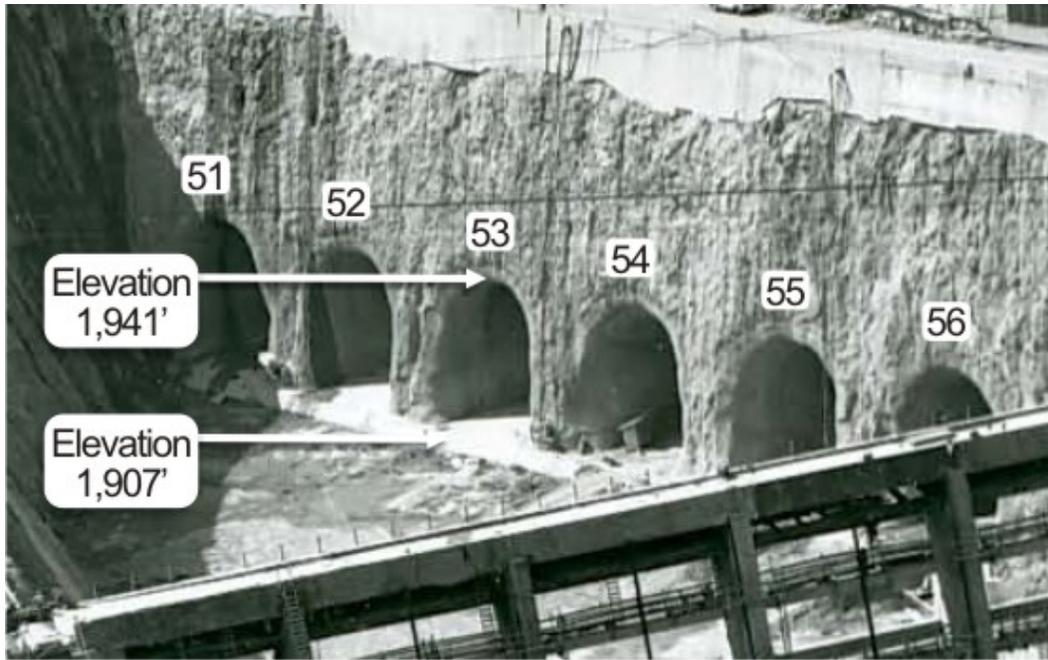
Photograph of the powerhouse during Project construction, showing the six turbine unit intakes. Elevations use NAVD 88 datum.
